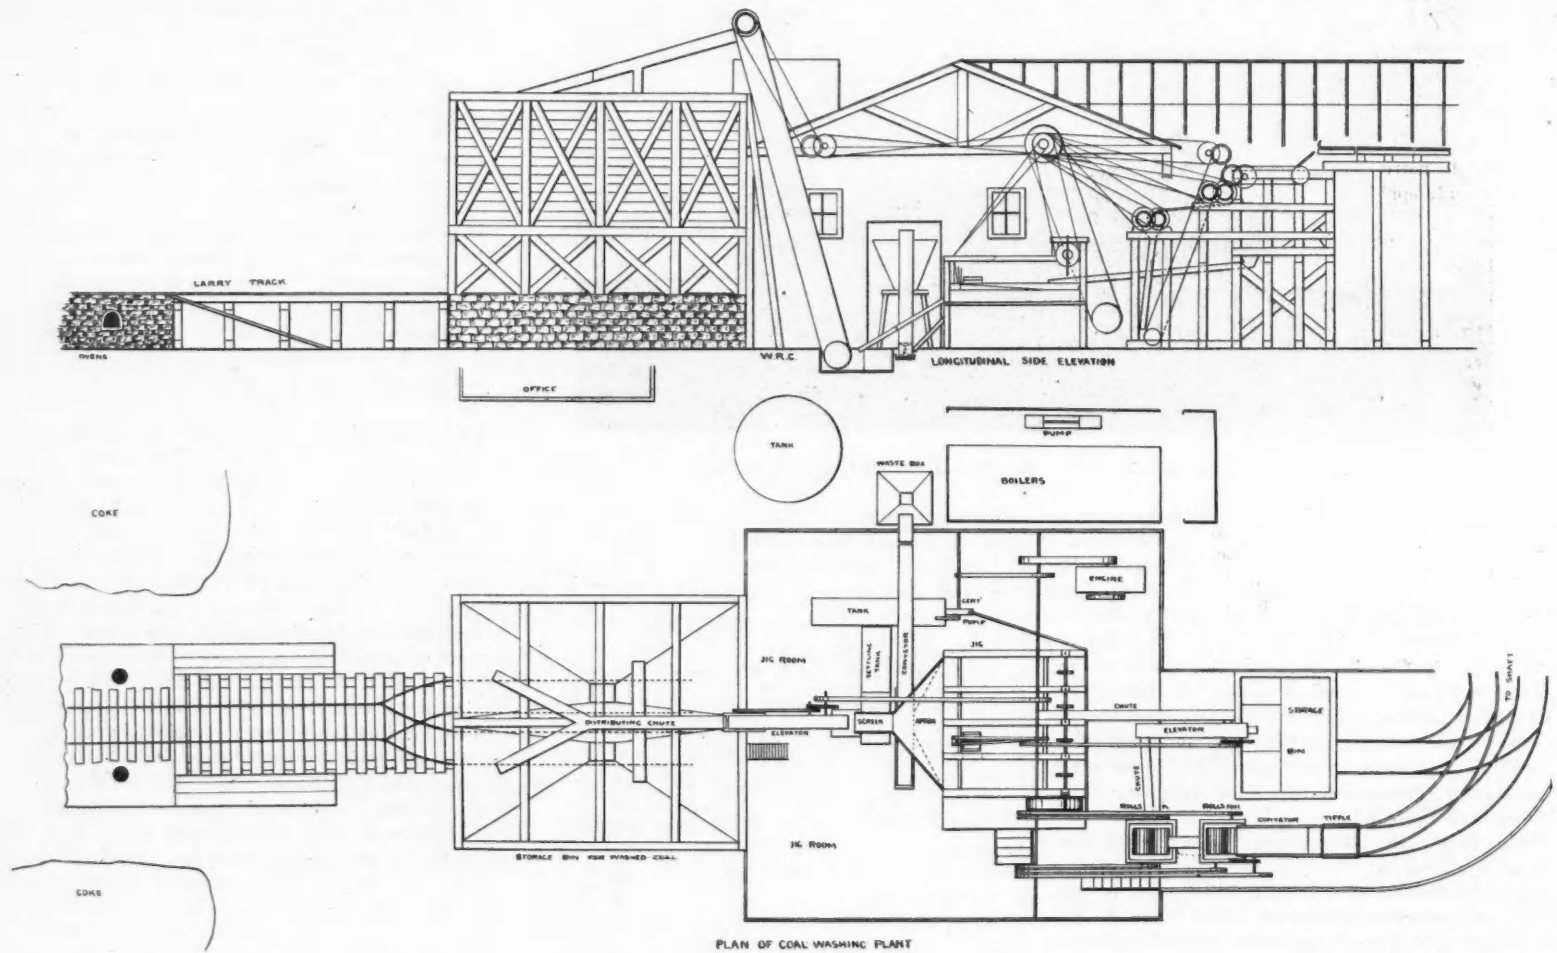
PLAN AND ELEVATION OF COAL WASHING PLANT.
